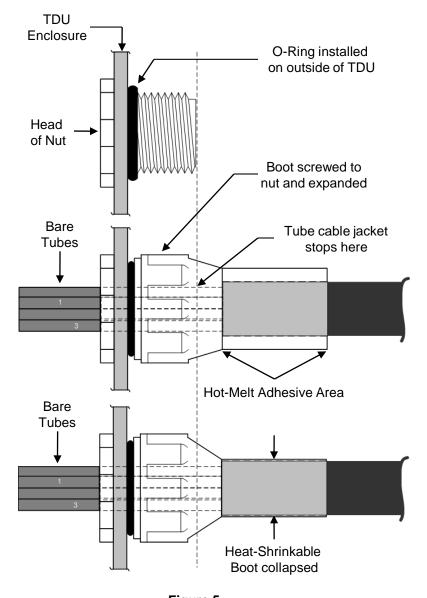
Installation Method for 19-Tube Cables (Riser- and Plenum-rated) (Tube Cable Jackets Stop at Boot Opening or Nut Opening)
